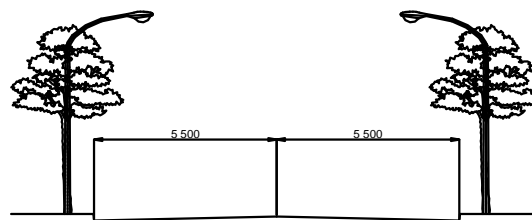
(1) Existing Cross Section at Ribaué Town
